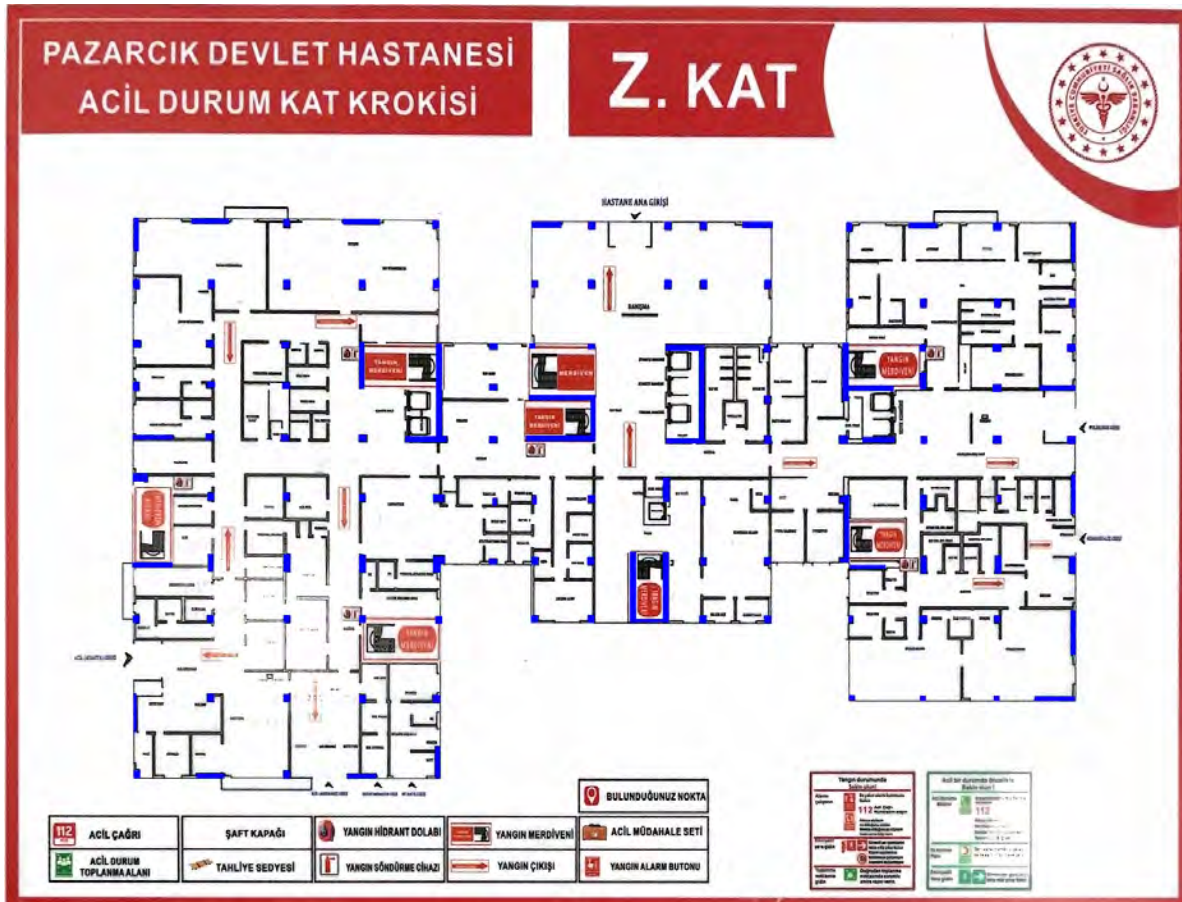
Pazarcık Government Hospital Floor Plan. Blue lines indicate concrete shear walls.
